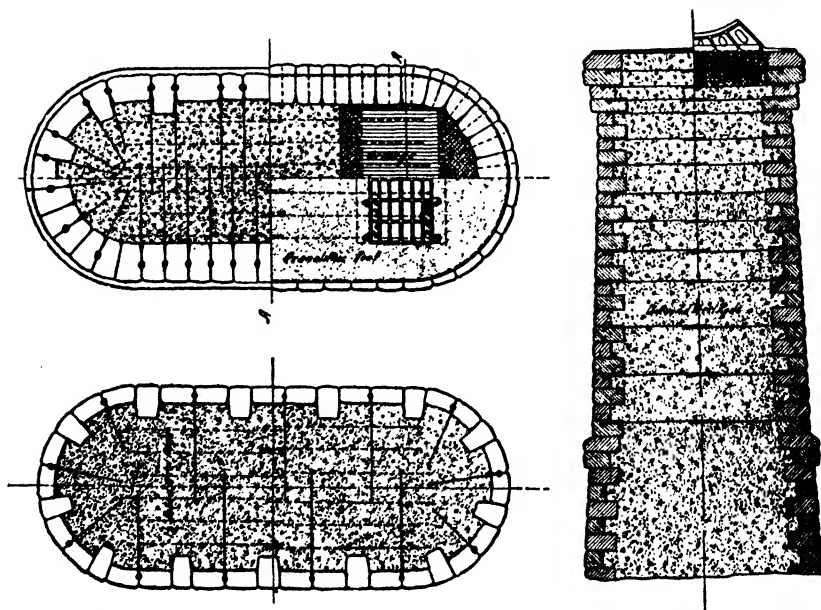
Cross Section and Plans of Pier 3, Pittsburgh and Lake Erie Railway Bridge over Ohio River, Beaver, Pa.
